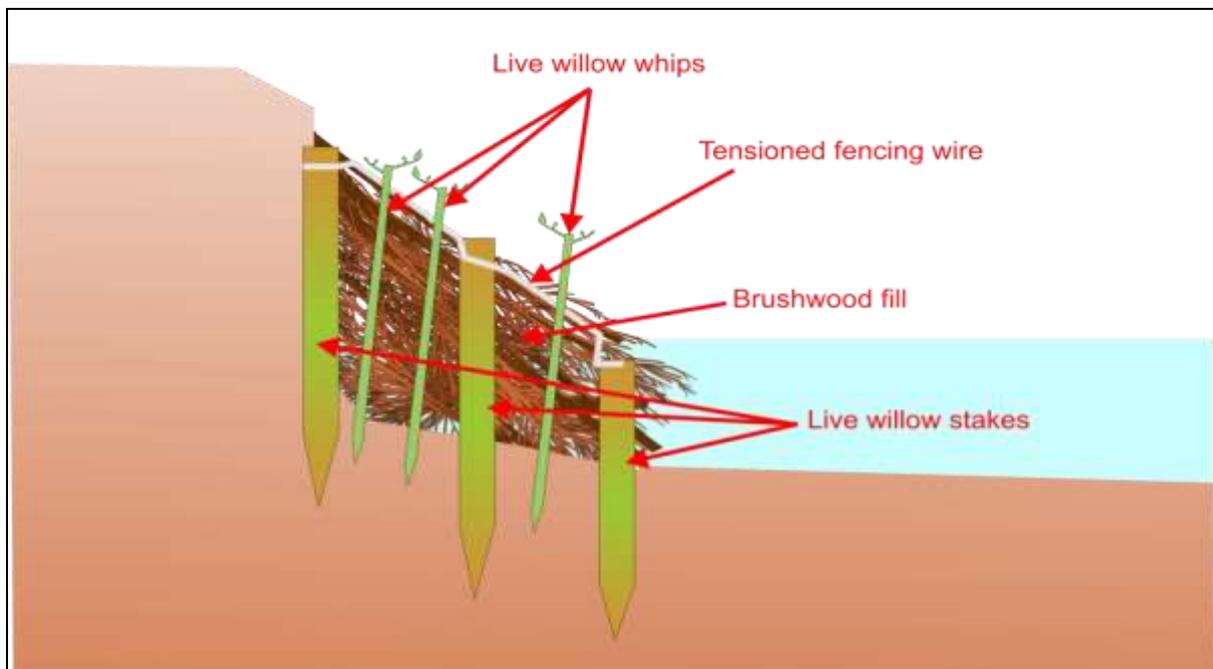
A cross section illustration of a brushwood erosion protection installation with live willow
